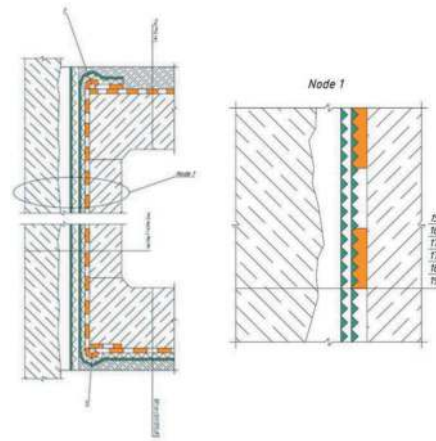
Waterproofing with two-layer sprayed waterproofing coatings with adhesion to freshly laid concrete of the monolithic wall construction of an underground structure without backfill cavities (Node 1): 1 – compensating loop; 2 – protective layer of concrete on mesh; 3 – sprayed waterproofing coating with primary and secondary adhesion; 4 – reinforced concrete floor; 5 – ditch sheeting – ‘diaphragm wall’; 6, 16 – levelling layer (if necessary); 7 – two layers of geocomposite material; 8 – waterproofing coating with primary and secondary adhesion applied to the geotextile of the geocomposite material; 9 – reinforced concrete wall; 10 – concrete buckle plate; 11 – protective sand cement screed; 12 – waterproofing coating with primary and secondary adhesion applied to the geotextile of the geocomposite material; sprayed waterproofing coating with primary and secondary adhesion; 13 – geocomposite material; 14 – concrete bedding; 15 – ditch sheeting - ‘diaphragm wall’; 17 – geocomposite material (polyethylene film + geotextile, facing a layer of polyethylene film to the ‘diaphragm wall’); 18 – sprayed waterproofing coating with primary and secondary adhesion applied to a geotextile geocomposite material; 19 – concrete load bearing wall.
